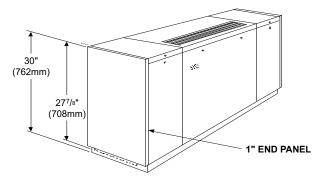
Install End Panels With Provided Hardware (1" End Panel Shown)
